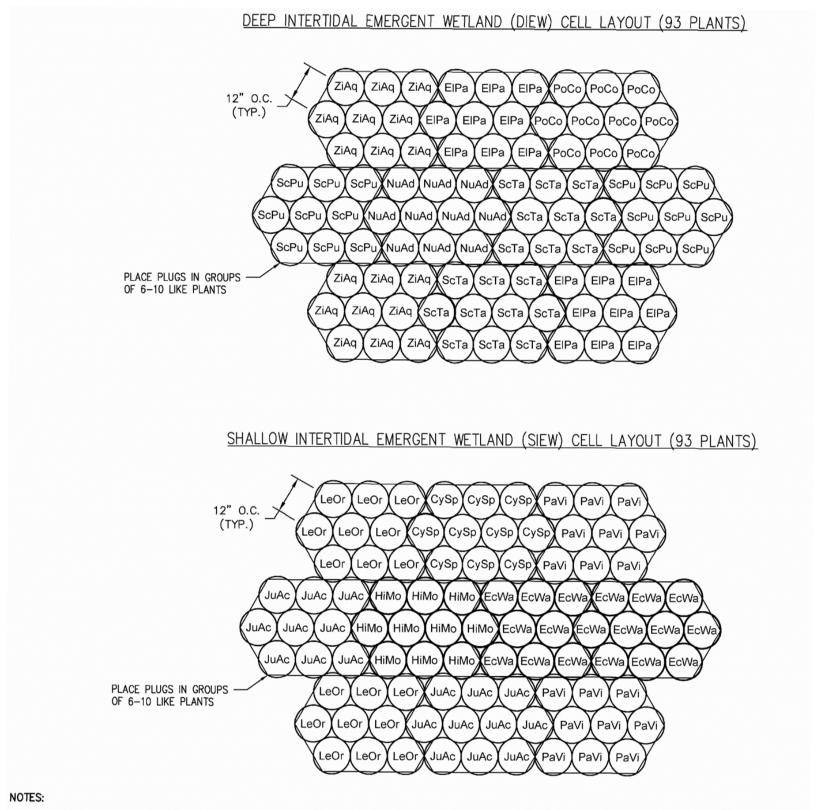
# DETAIL: TYPICAL INTERTIDAL WETLAND PLANTING PLAN SCALE: HORIZ. 1"=20'
